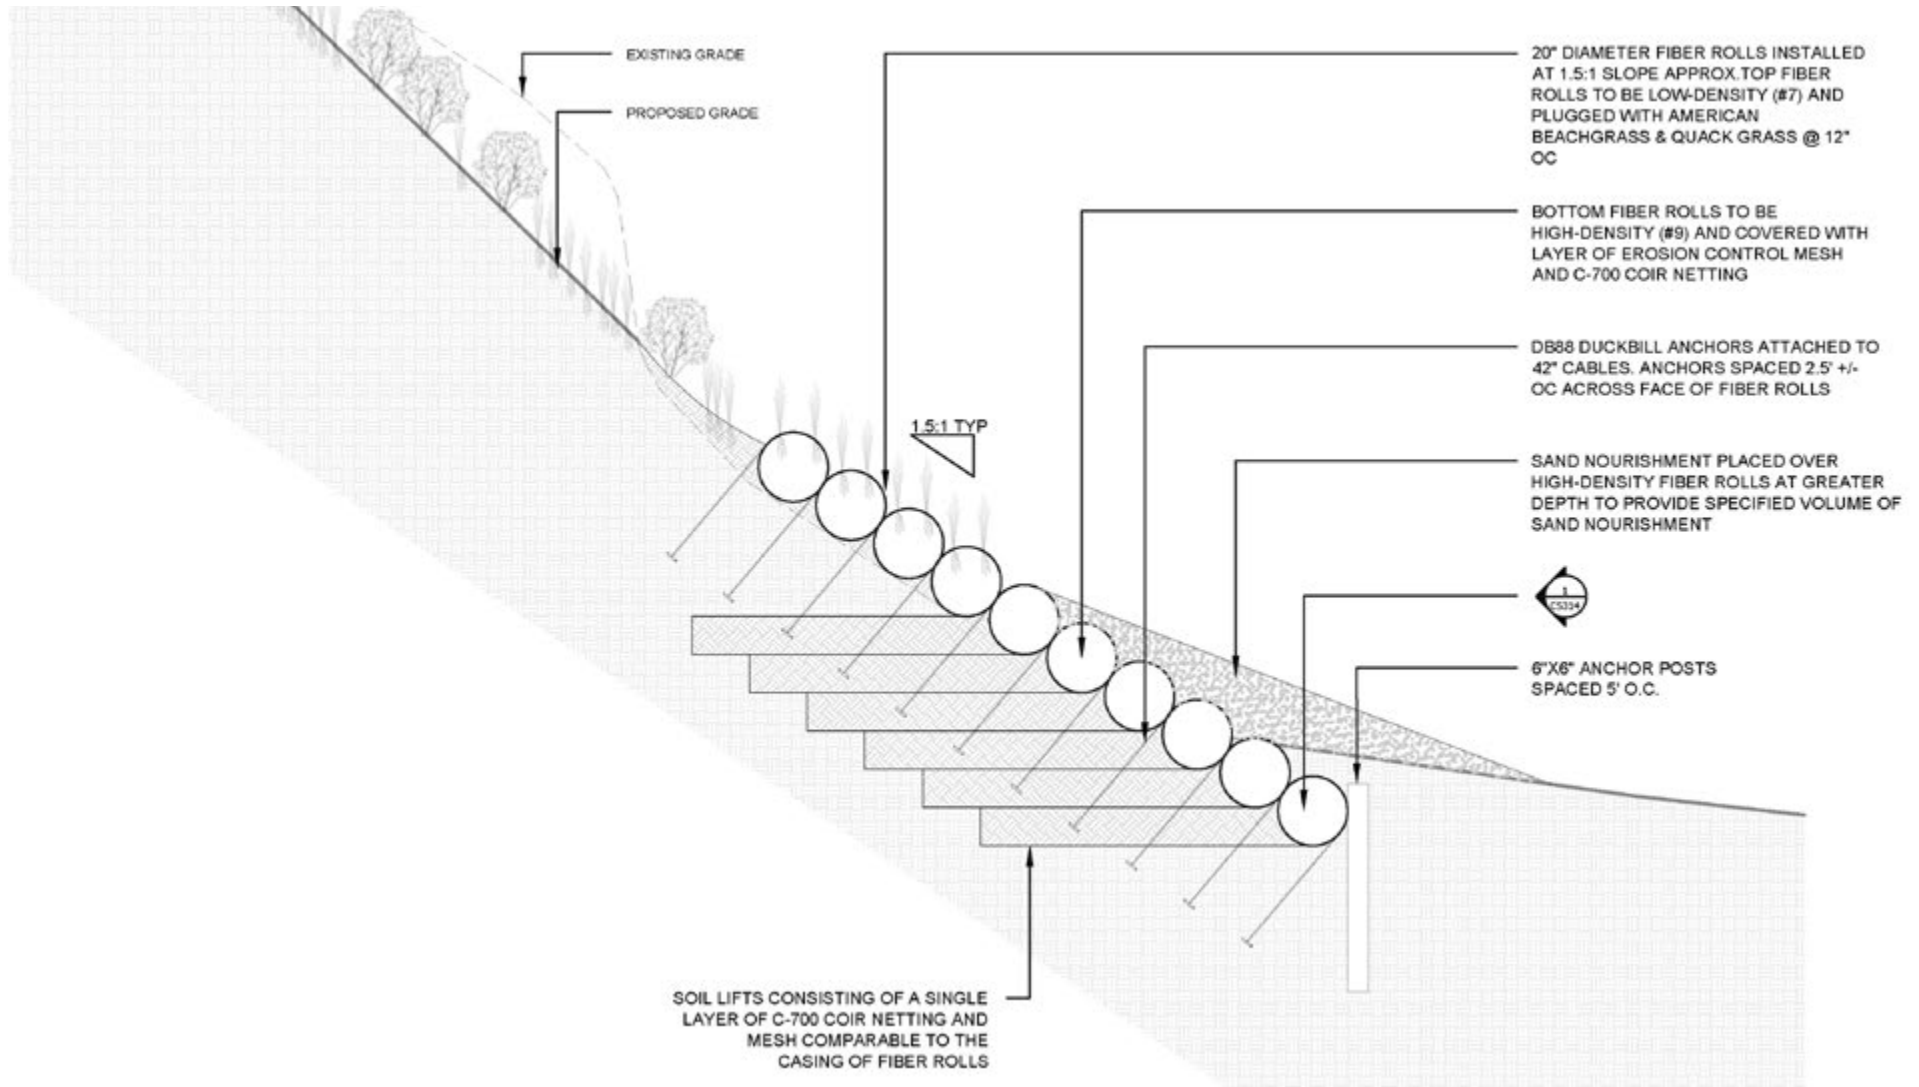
DETAIL PROVIDED BY WILKINSON ECOLOGICAL DESIGN, SPECIALISTS IN COASTAL STABILIZATION CONSTRUCTION
